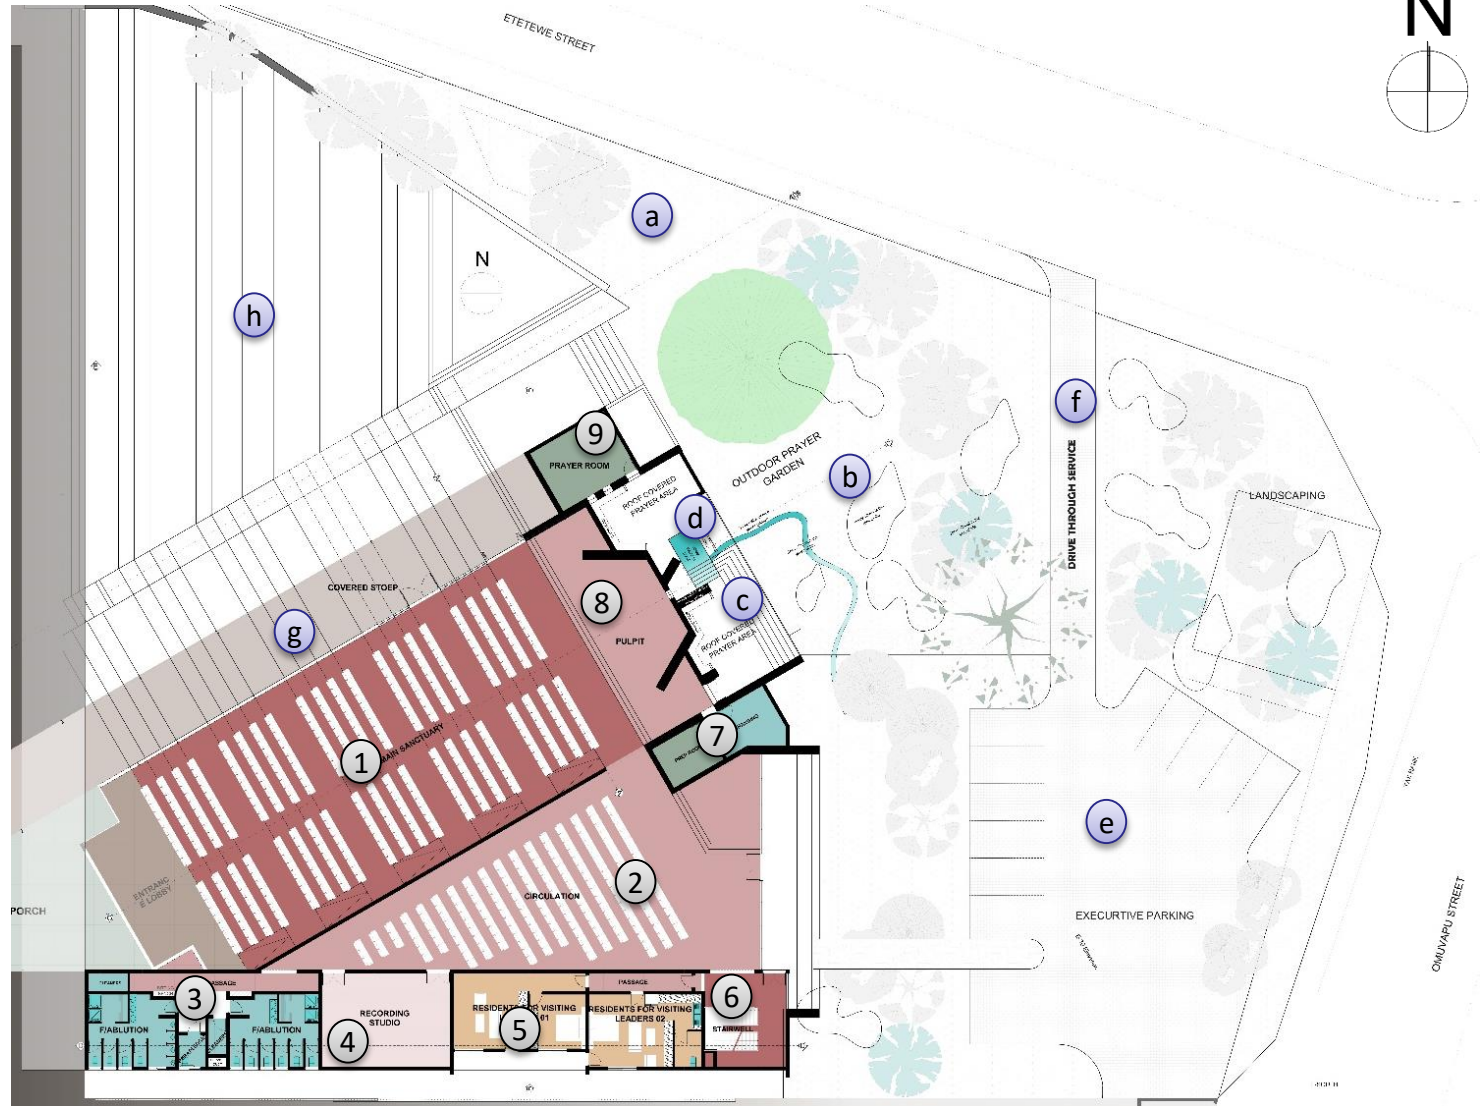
Lower level floor layout plan. (Author 2021).
